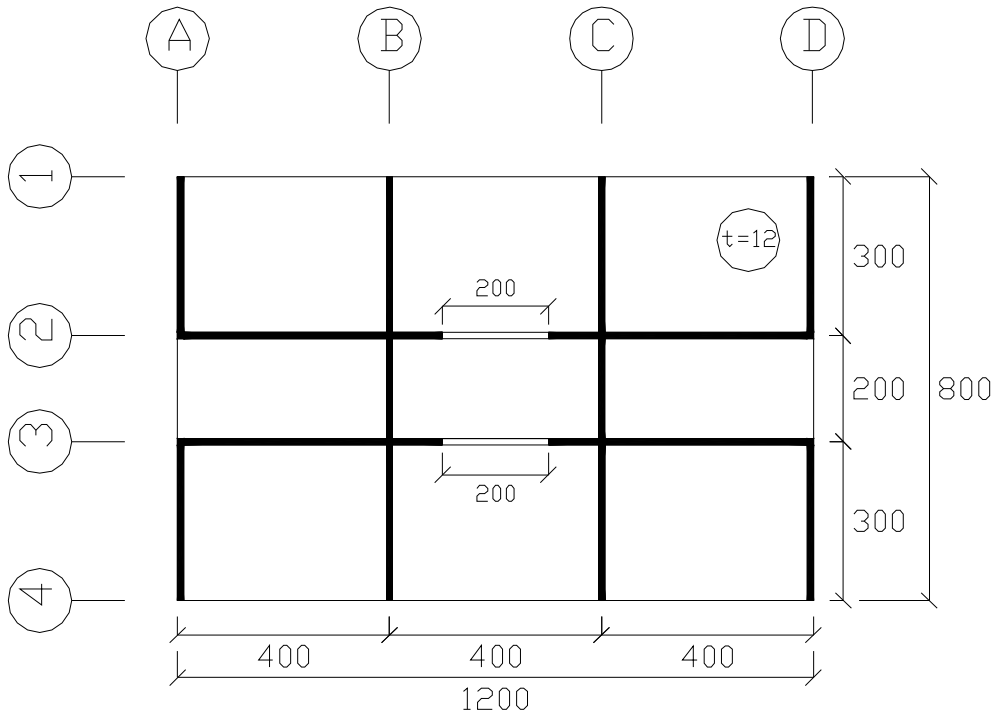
Typical plan view – Plan No. 8 (units in cm)
